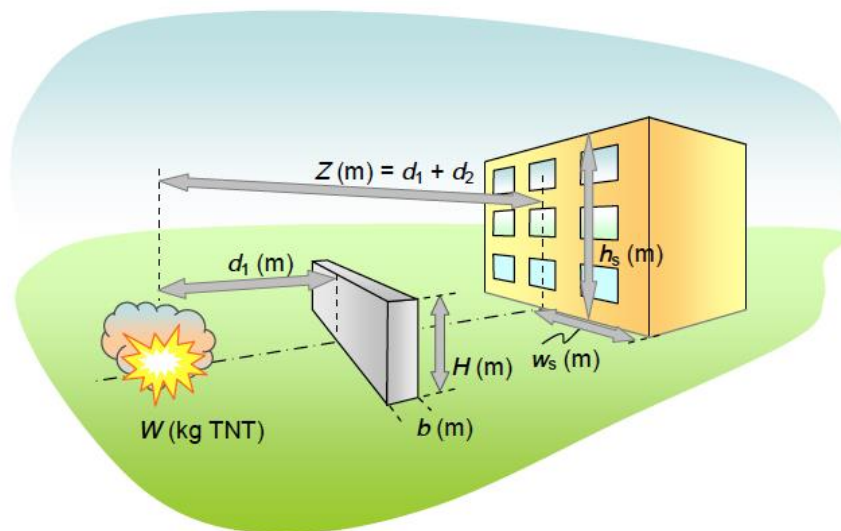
Blast Wall Configuration (Bewick et al. 2011)
